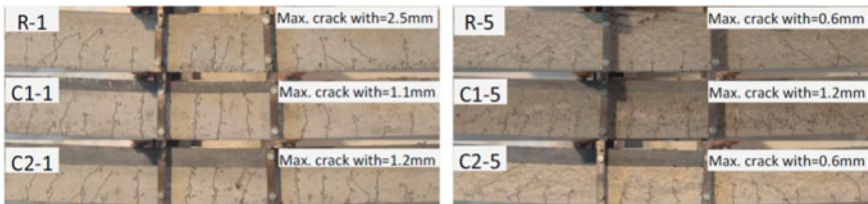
Crack patterns and the measured maximum crack width of different reinforced concrete specimens [35]
